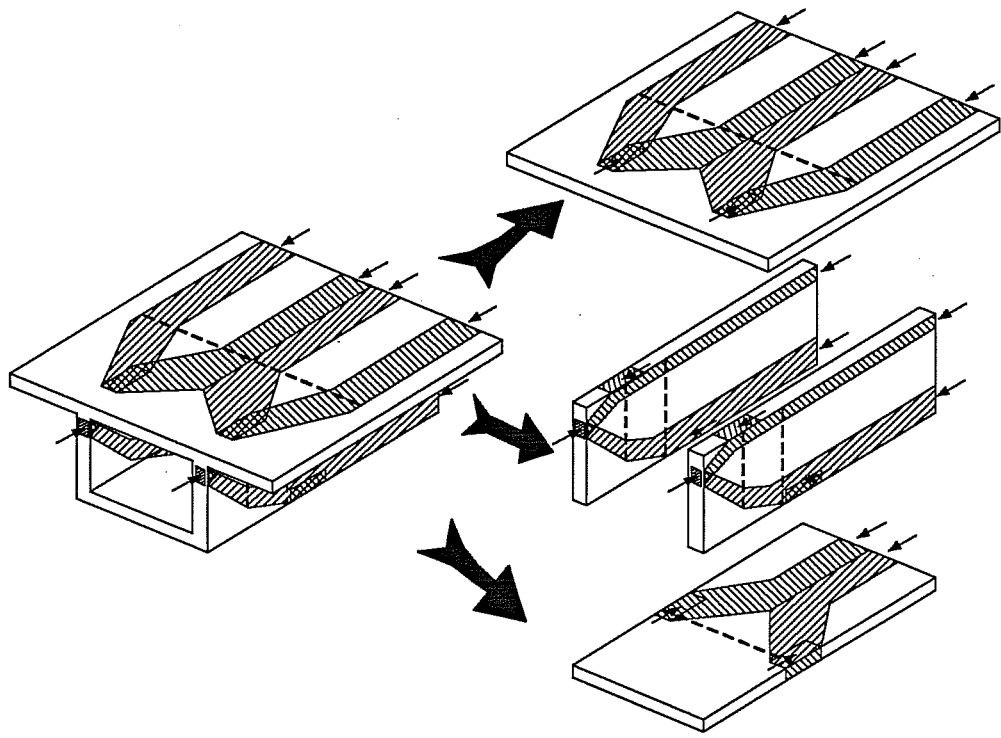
Flow of Forces in the Anchorage Zone of a Box Girder Cross Section
